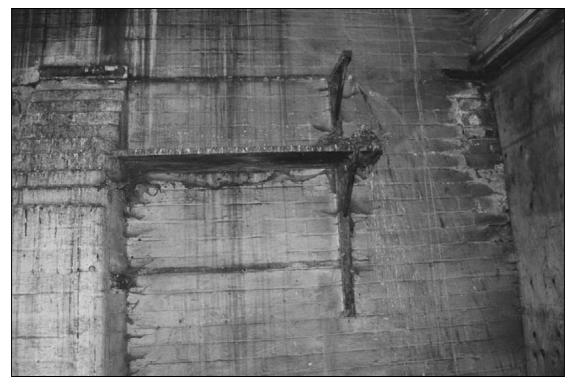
Detail of flue and shelves, south wall of S3 (film 41.26)
